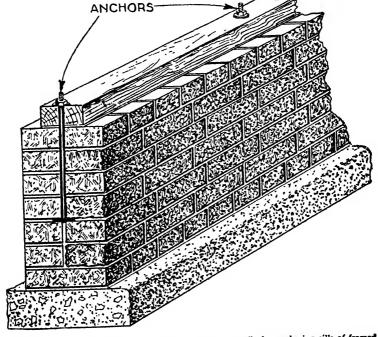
,359.—Place anchors built into brick foundation walls for anchoring sills of framed building.
